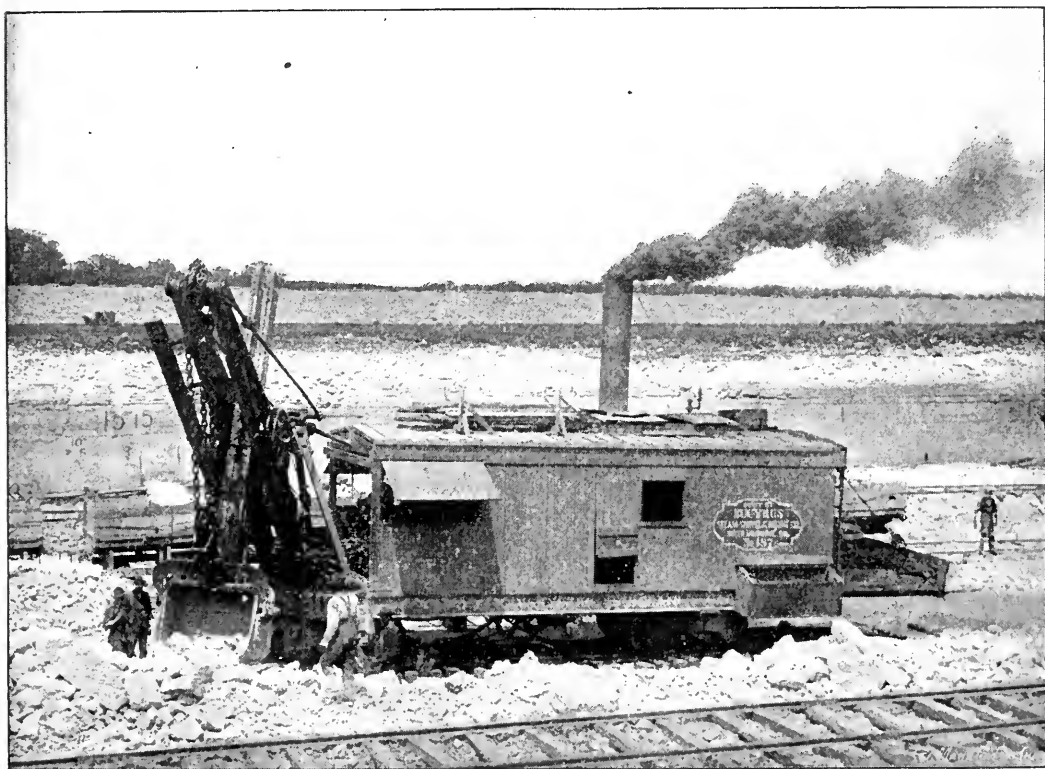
STEAM SHOVEL LOADING ROCK ON SECTION 15.
